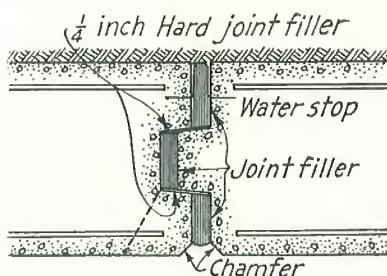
Horizontal section through expansion joint with key-and-groove construction.
